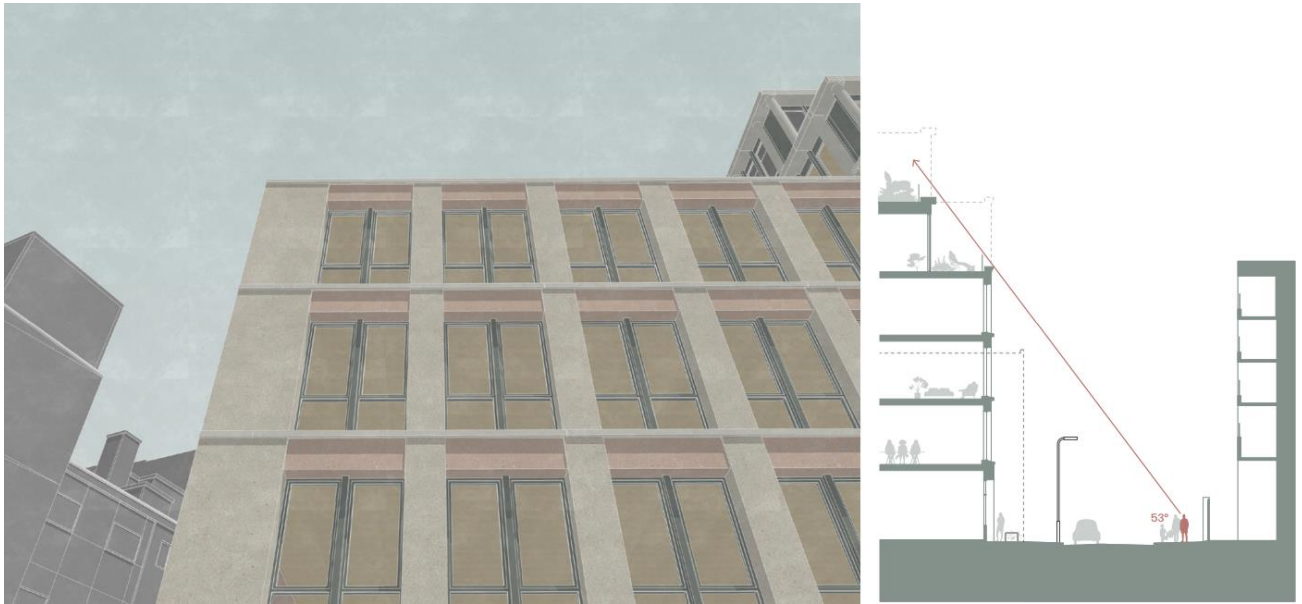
CGI of the 'sightline' from the pavement of the proposed building as seen from 10 Epworth Street
